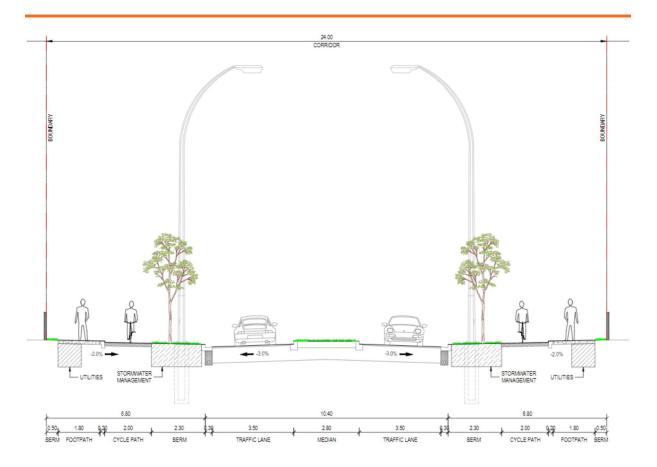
Ōpāheke Road (Urban Section) typical cross section (indicative)
